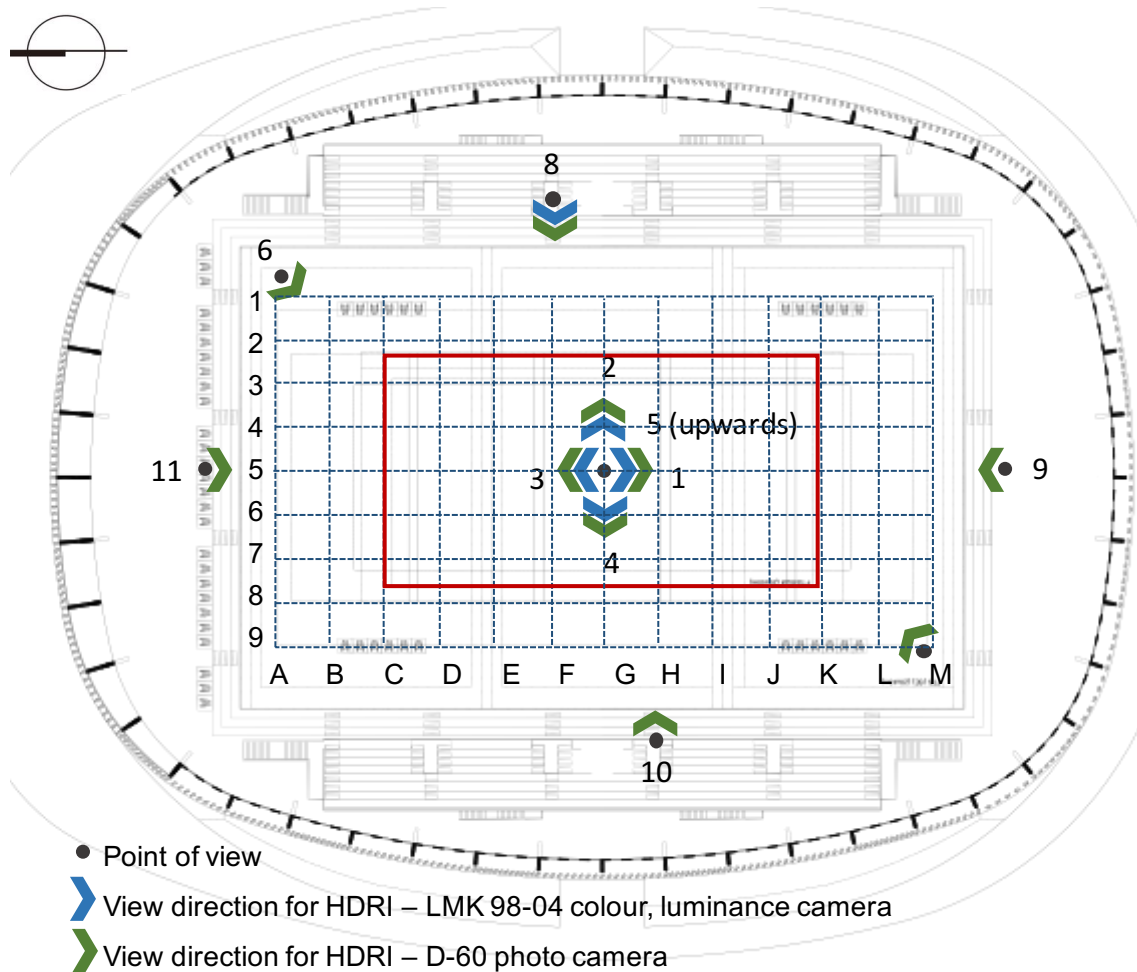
Floor plan layout of the PEC showing the orthogonal grid and viewpoints /view directions for in-situ measurements.
